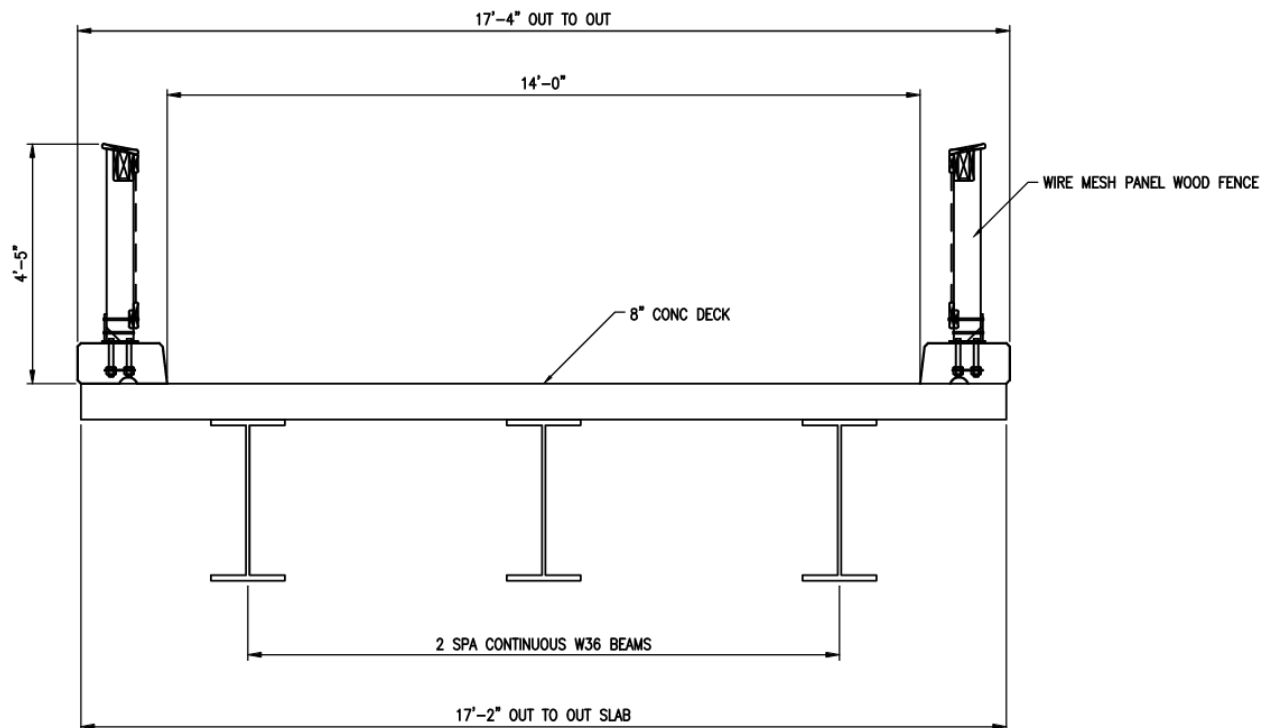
Deck Section of a Two-Span Continuous Steel Beam Bridge
